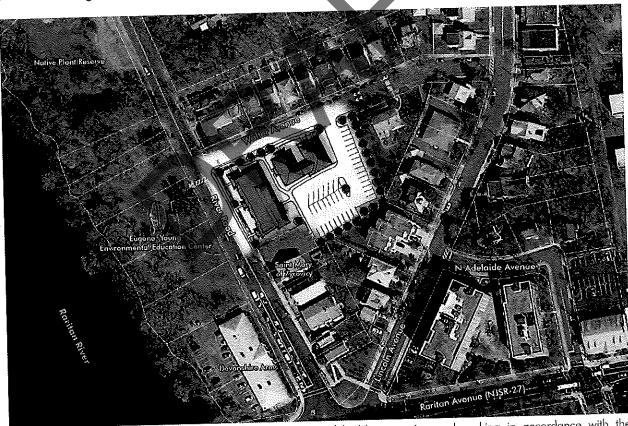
Concept Plan illustrating potential arrangement of building massing and parking in accordance with the Redevelopment Plan
